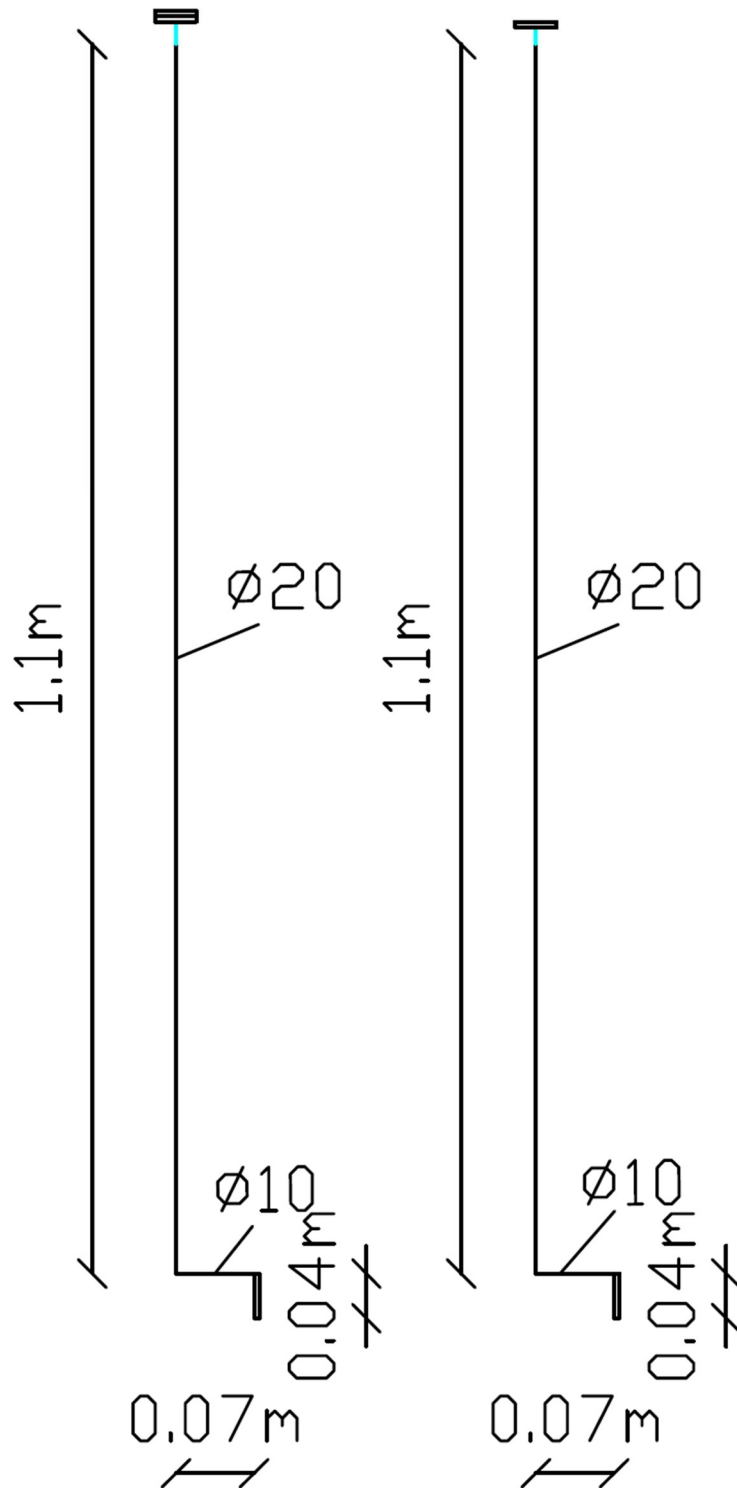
Cross section of living wall 3-2 left, 3-2 right
